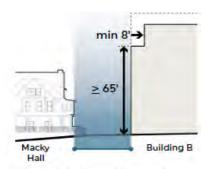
West facade of Building B height reduction and stepback requirement for 85% of elevation
